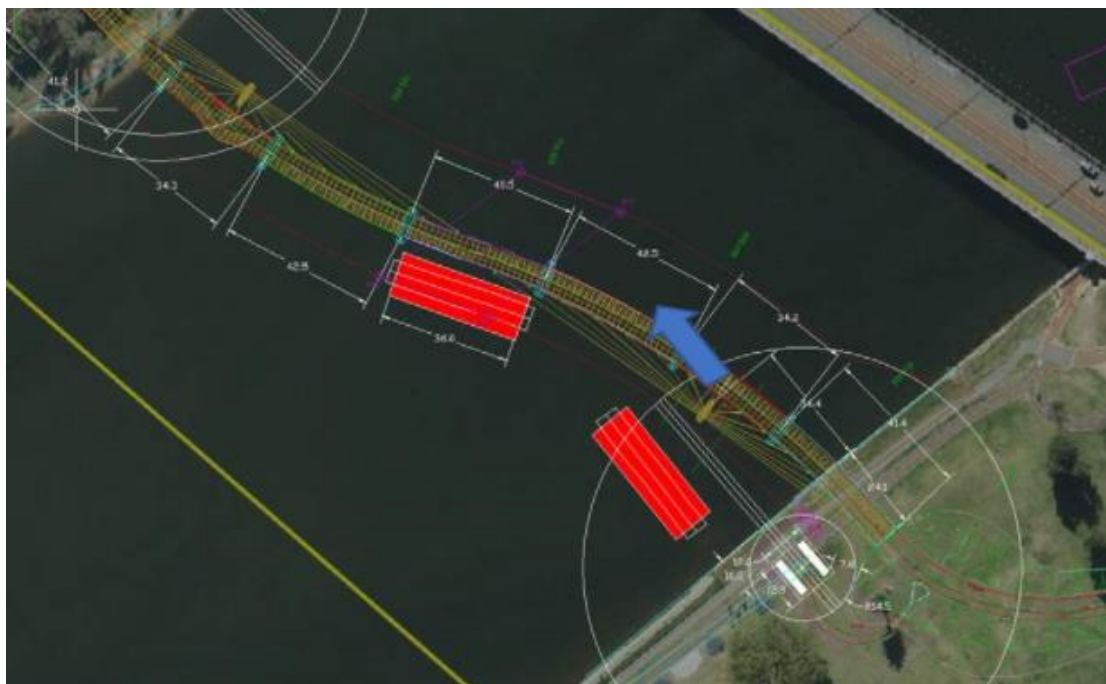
McCallum Park Bridge - Barge movement for installation of deck segment 4
